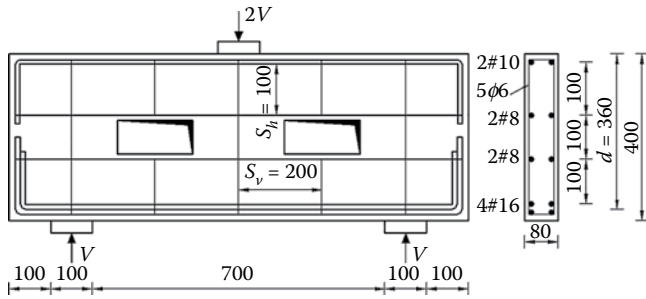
Example on strength assessment of a deep beam with large openings—reinforcement details.
